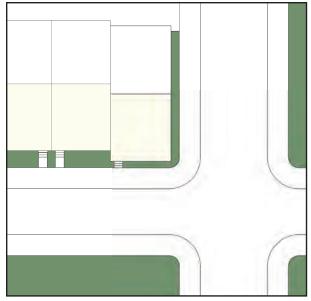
Plan View, Townhouse (Illustrative)
